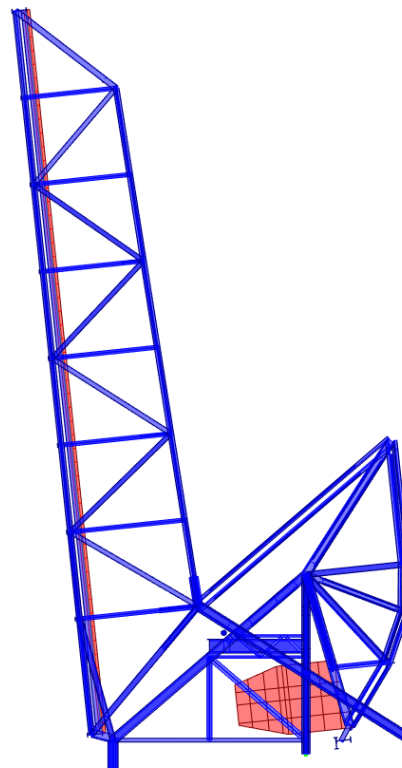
Screenshot of LaSalle Causeway Bascule Bridge Finite Element Model- 84o Opening – North View
